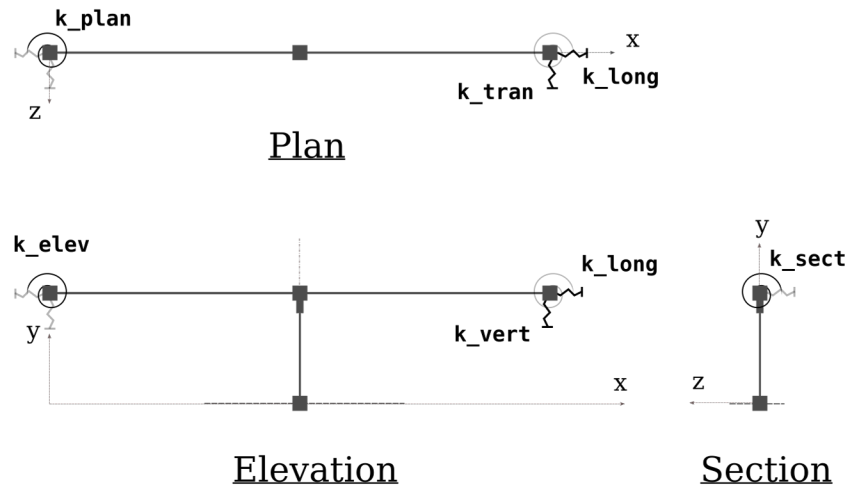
A low-fidelity model of Caltrans bridge No. 58-0215 (Meloland Road Overpass).
